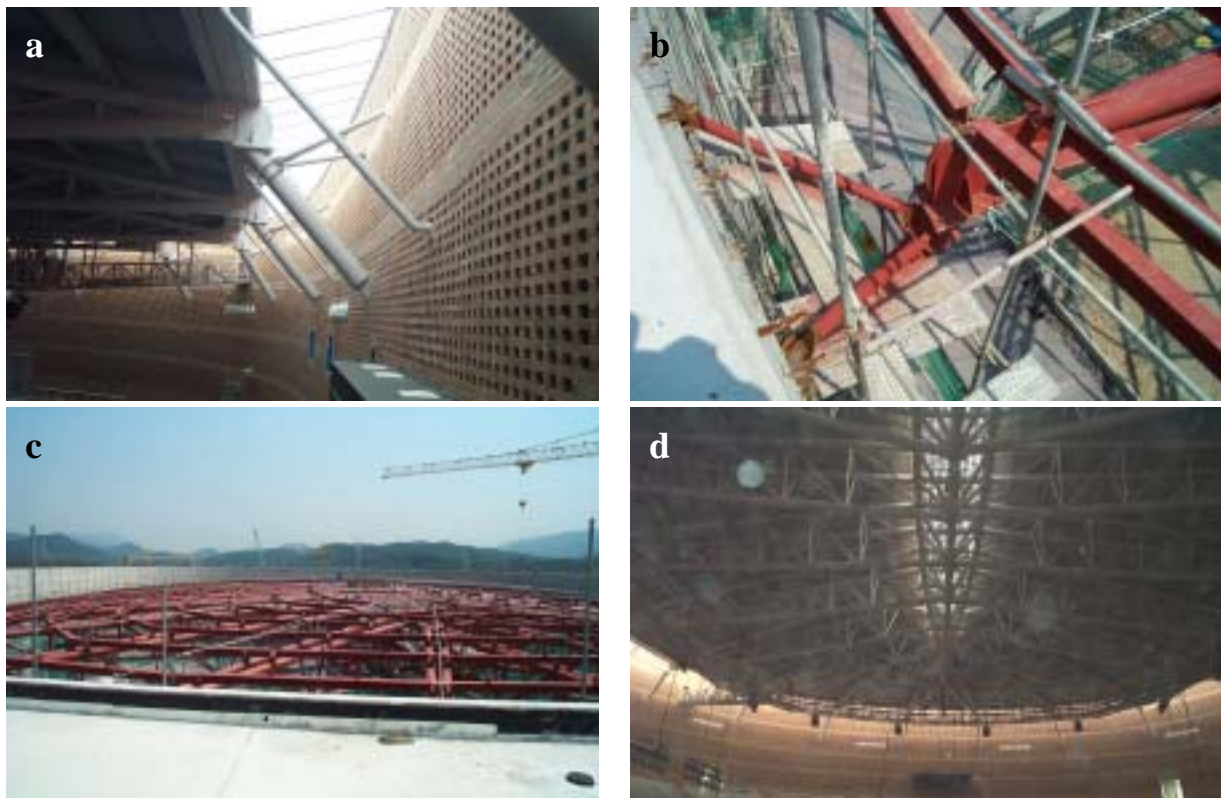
a),b) triangular support - construction, c) exterior view, d) interior view of roof
